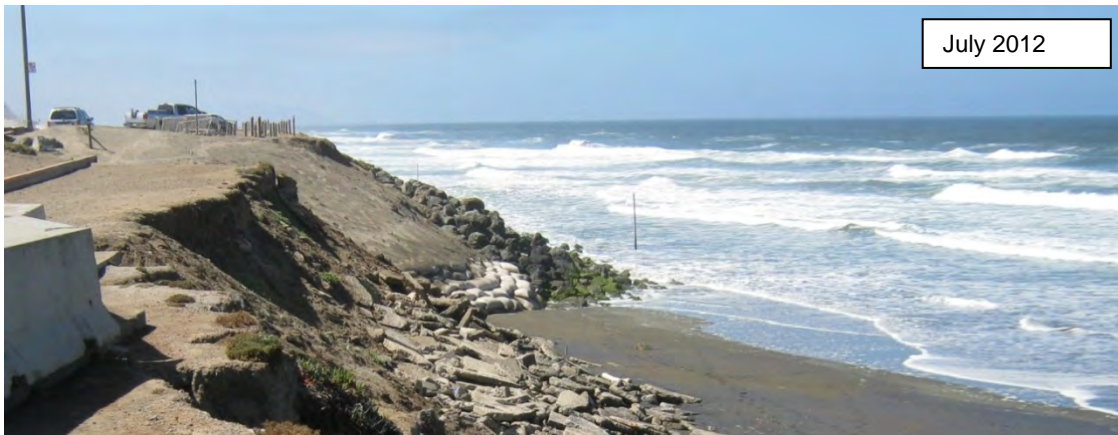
Photographs showing change in beach elevation at SOB in early 2012.
